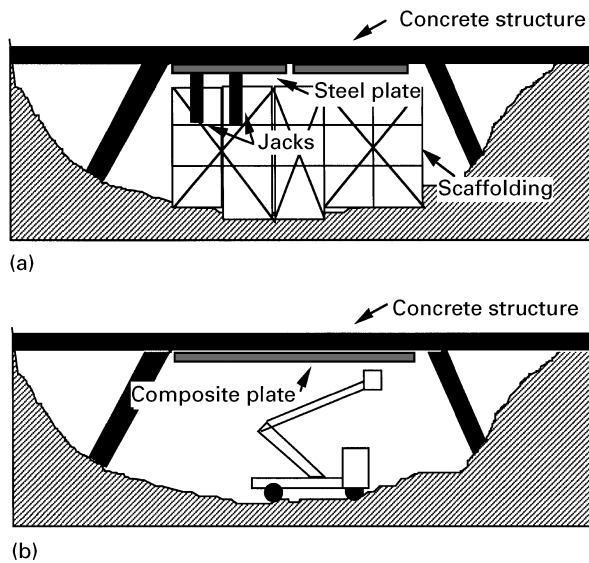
External strengthening through the use of bonded reinforcement plates (a) Steel, (b) Composite.
